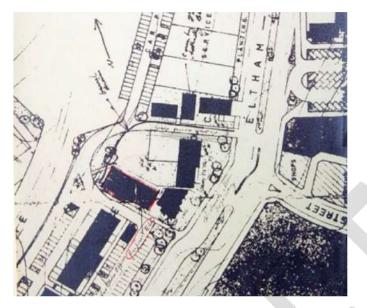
Site plan prepared c.1965, showing location of the proposed Elderly Citizens Centre (outlined in red). (Source: Public Building File No.13712, Unit 1624, VRPS 7882, PROV, cited in Westbrooke 2010:16)
